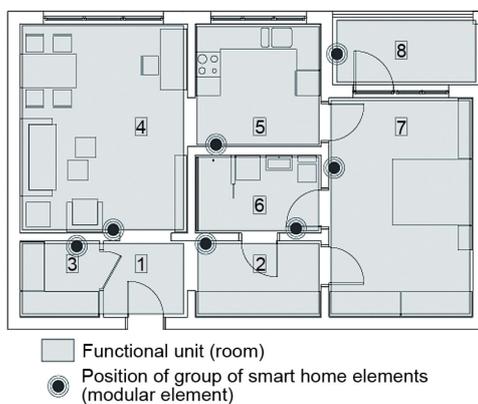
Functional zones and positions of modular elements; 1 – entrance hall, 2 – corridor, 3 – wardrobe, 4 – living room, 5 – kitchen, 6 – bathroom, 7 – bedroom, 8 – balcony
